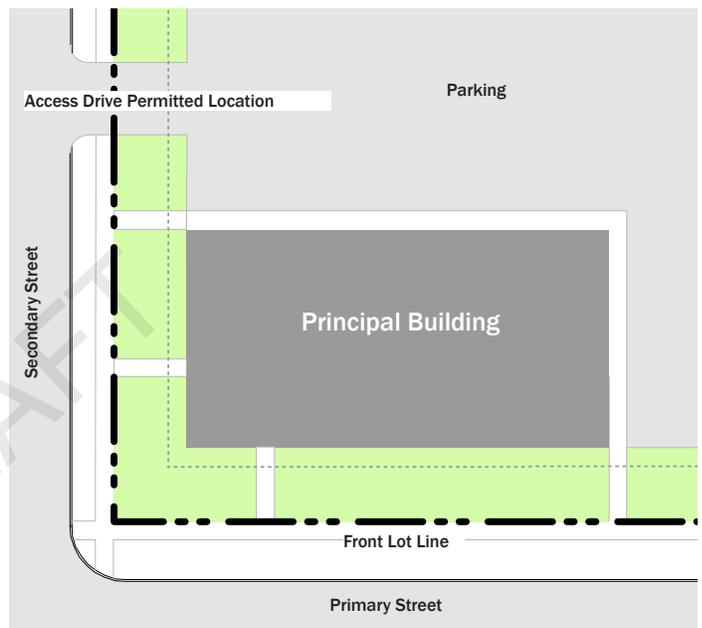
G (2). Secondary Street Frontage: Access Drive Permitted Location
